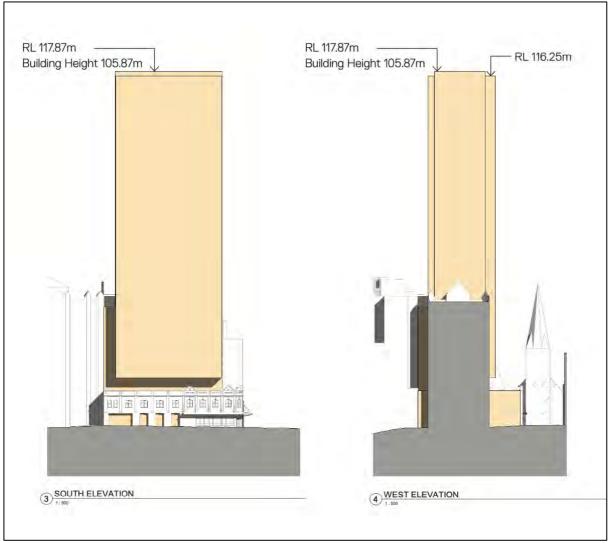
X South and West DCP Envelope Elevations (Source: Grimshaw October 2021)
